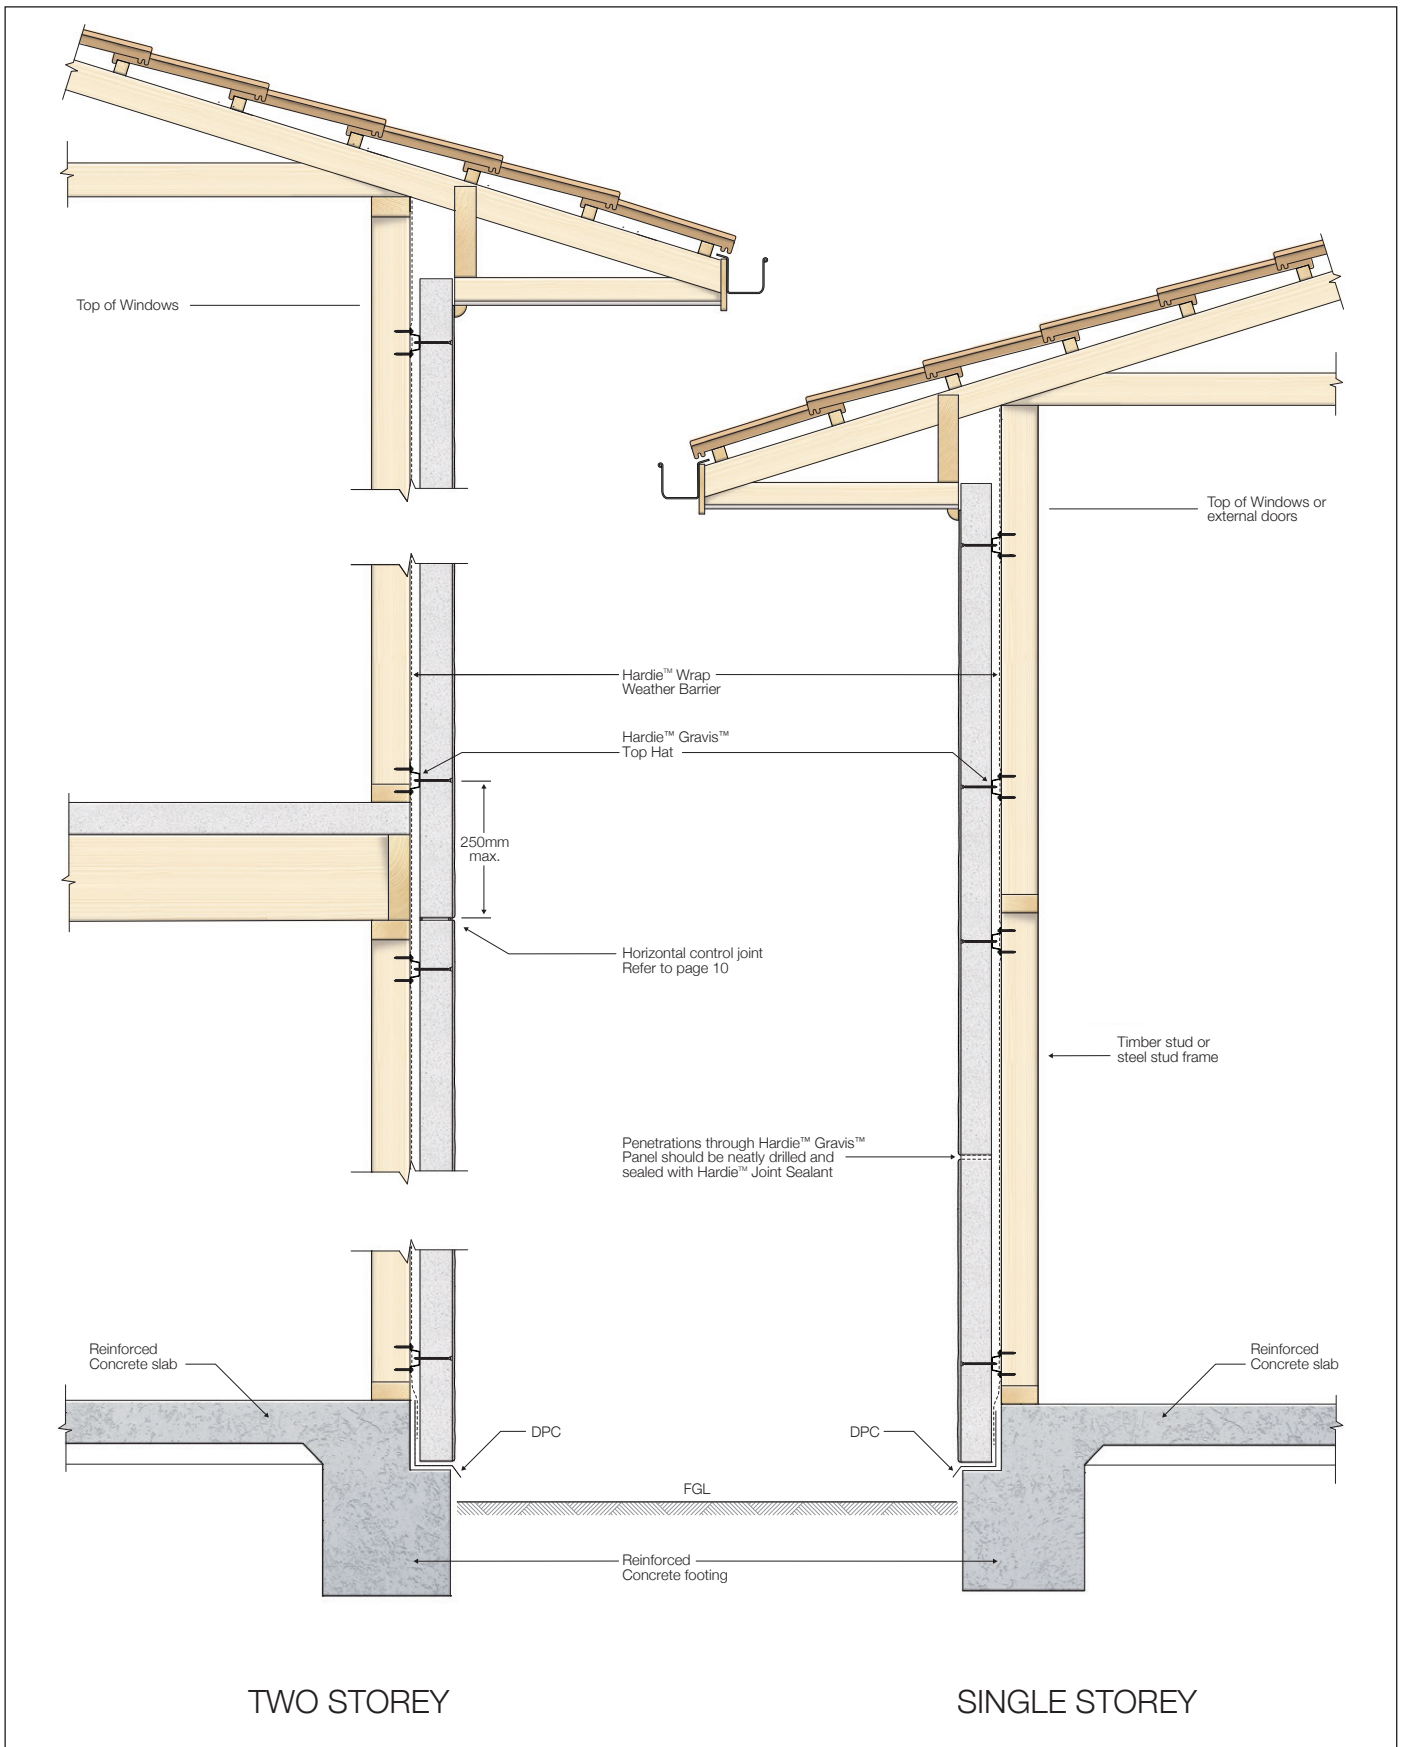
SINGLE & TWO STOREY LAYOUT - HIP ROOF ELEVATION
